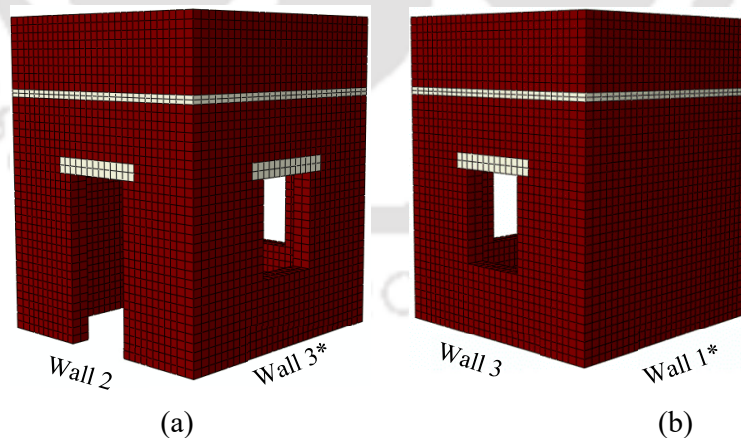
Finite element models of URM Building: (a) View 1, and (b) View 2.
